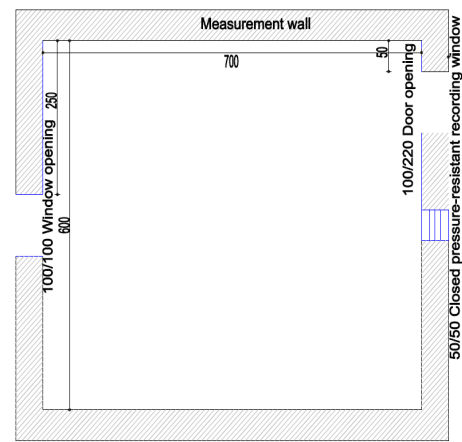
Plan of the reinforced concrete room built for the blast experiment
